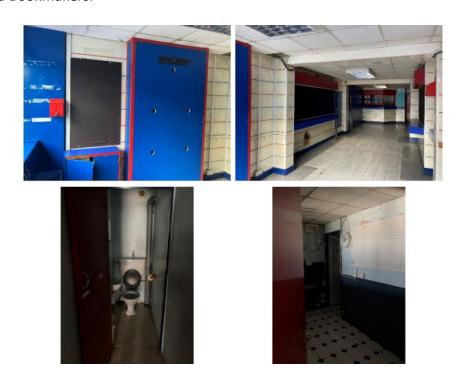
Interior of David James Racing betting shop, No.2 Oxford Street
